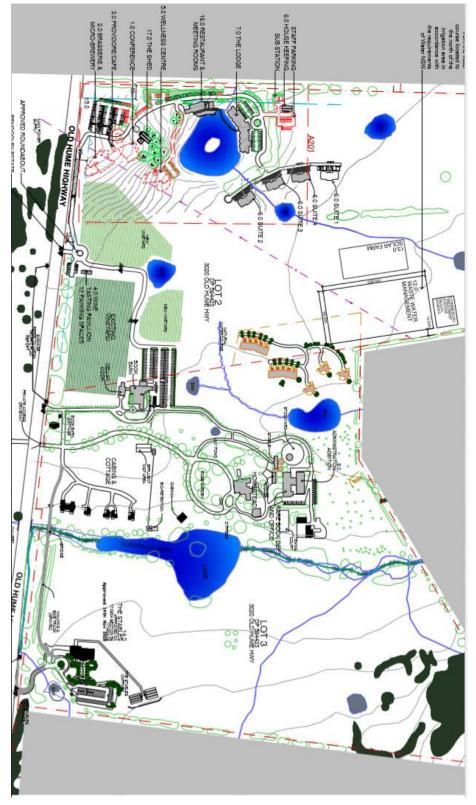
Proposed Concept Plan extractProposed modifications indicated in red
